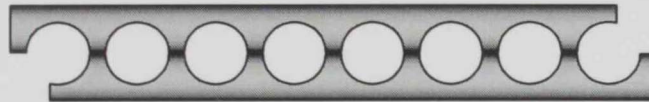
Manufacturing of Castellated Steel Beams
